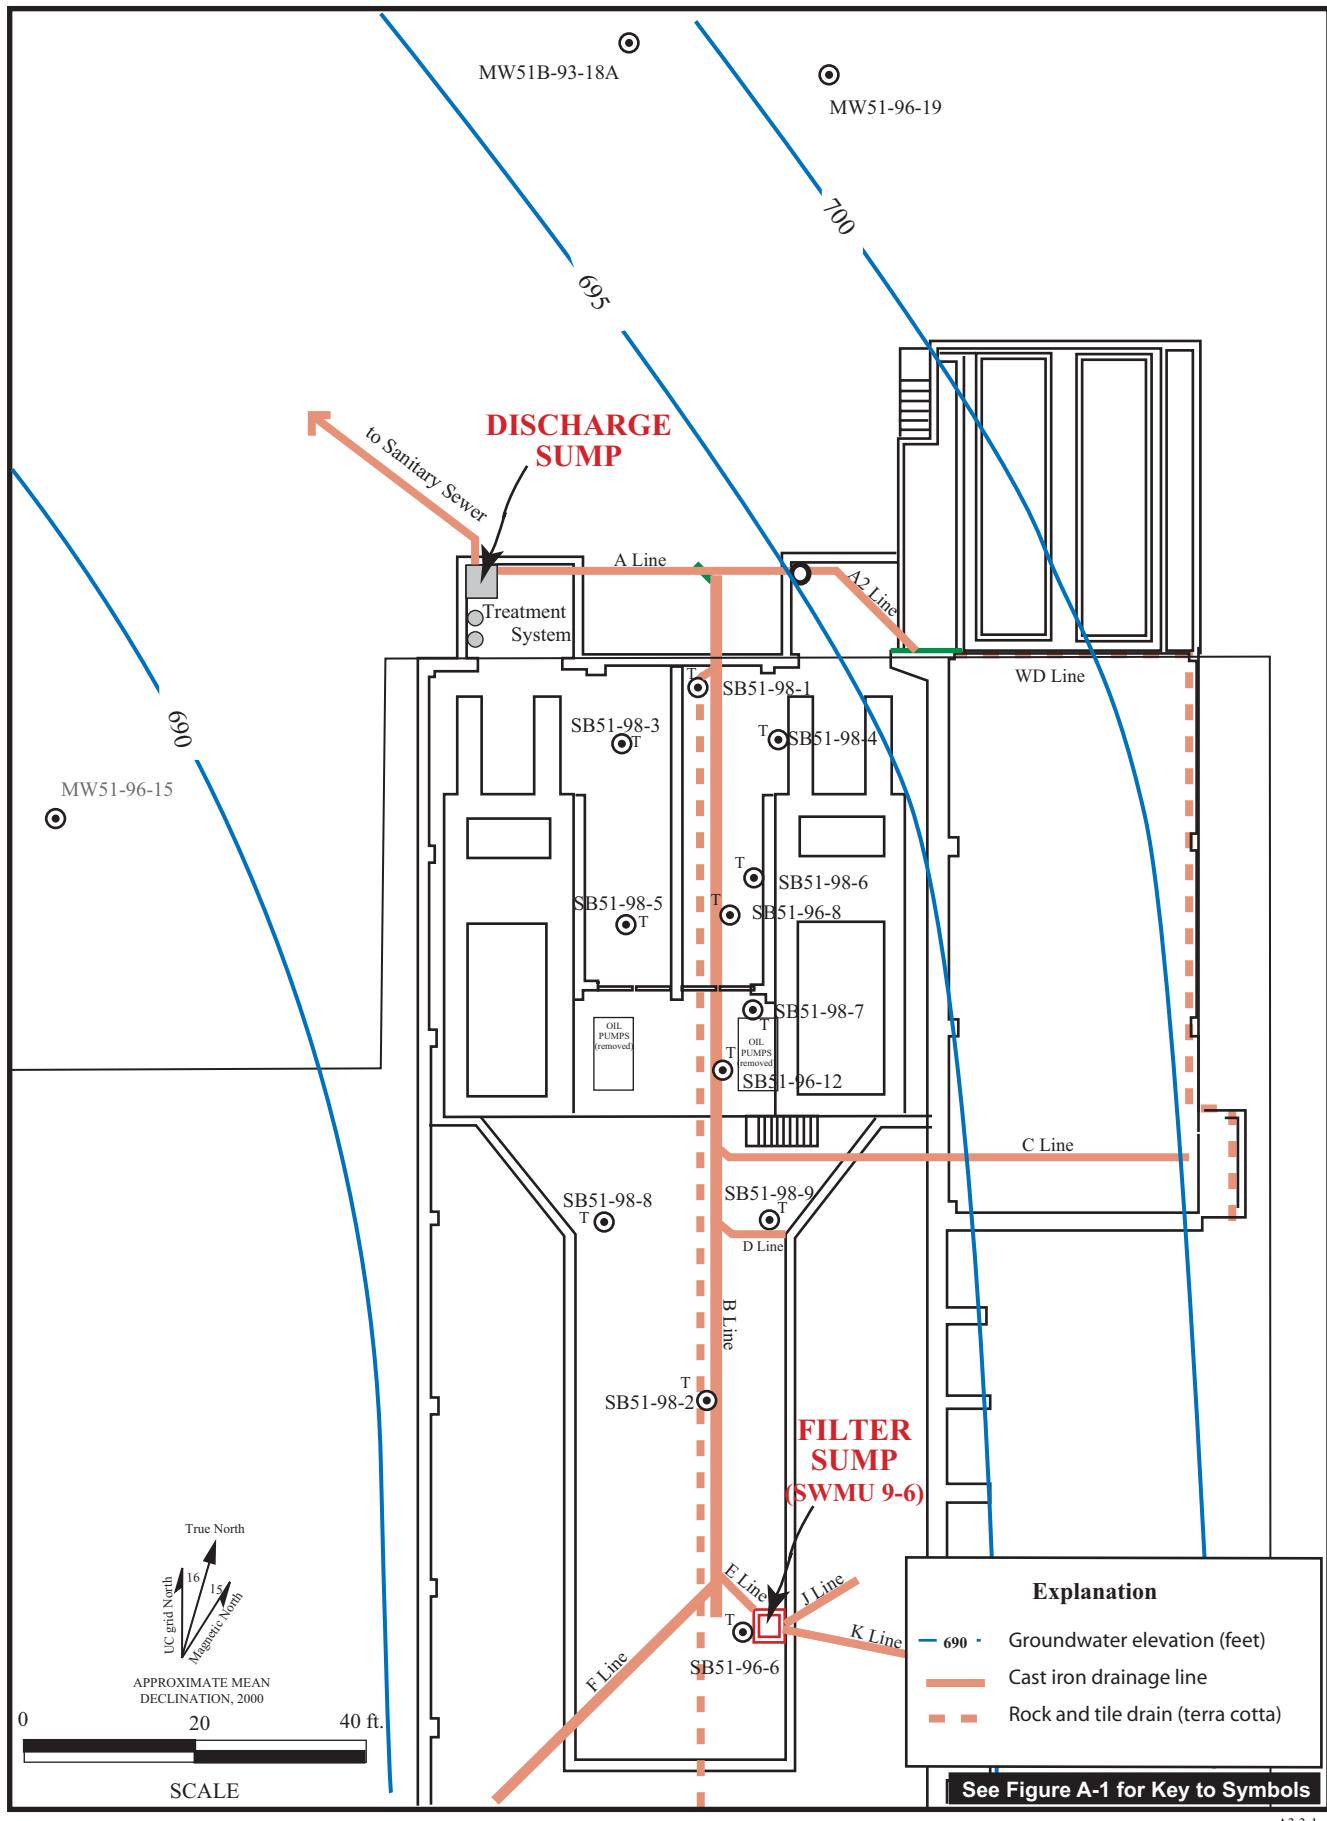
Building 51 Motor Generator Room Basement.
